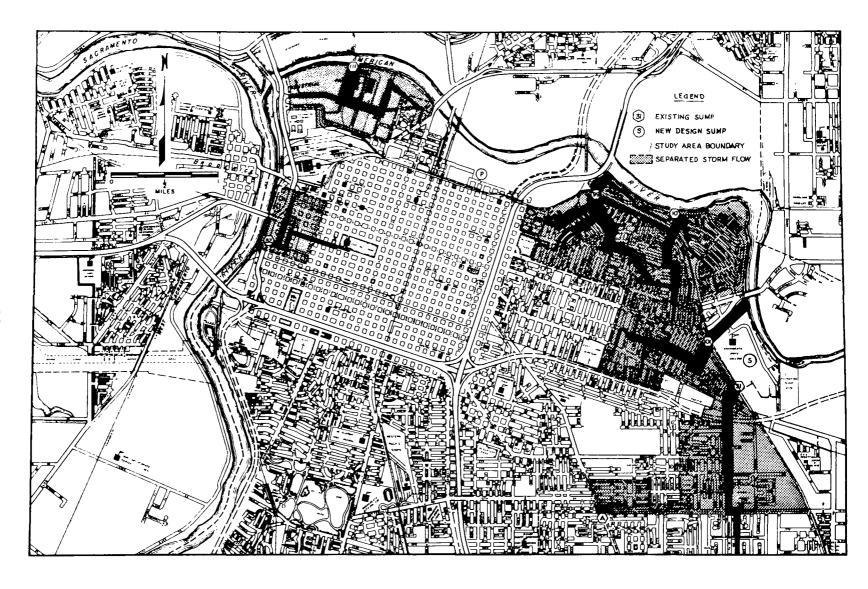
EXISTING SEPARATED STORM WATER SEWER SYSTEMS
